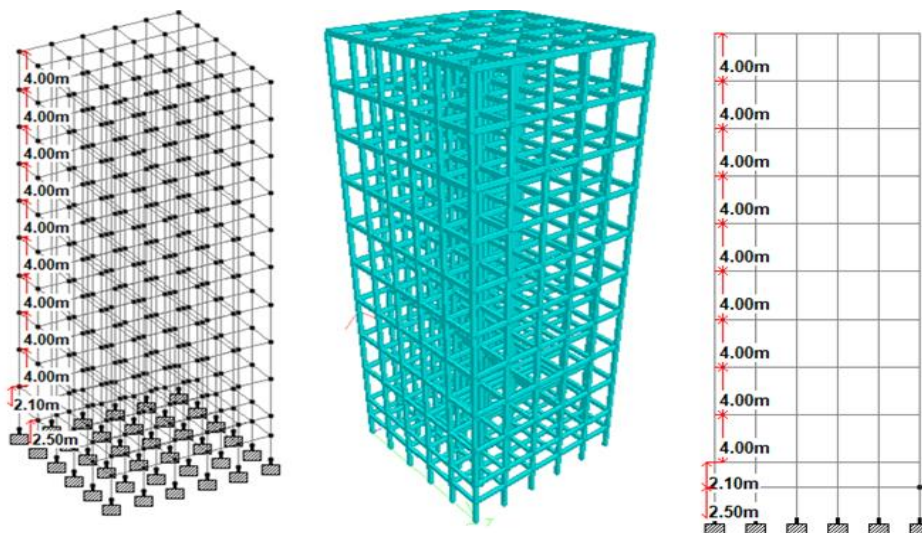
Open Ground Storey, 2.1 m Height and Column Section are (300 x 300) mm
